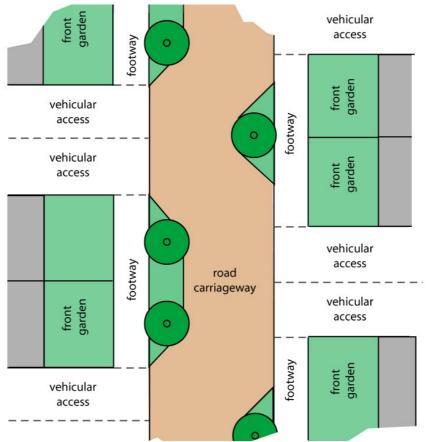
A plan view of the hybrid form shown in Figure 5. The street tree planting on alternate sides of the street can be part of a traffic-calming chicane.
